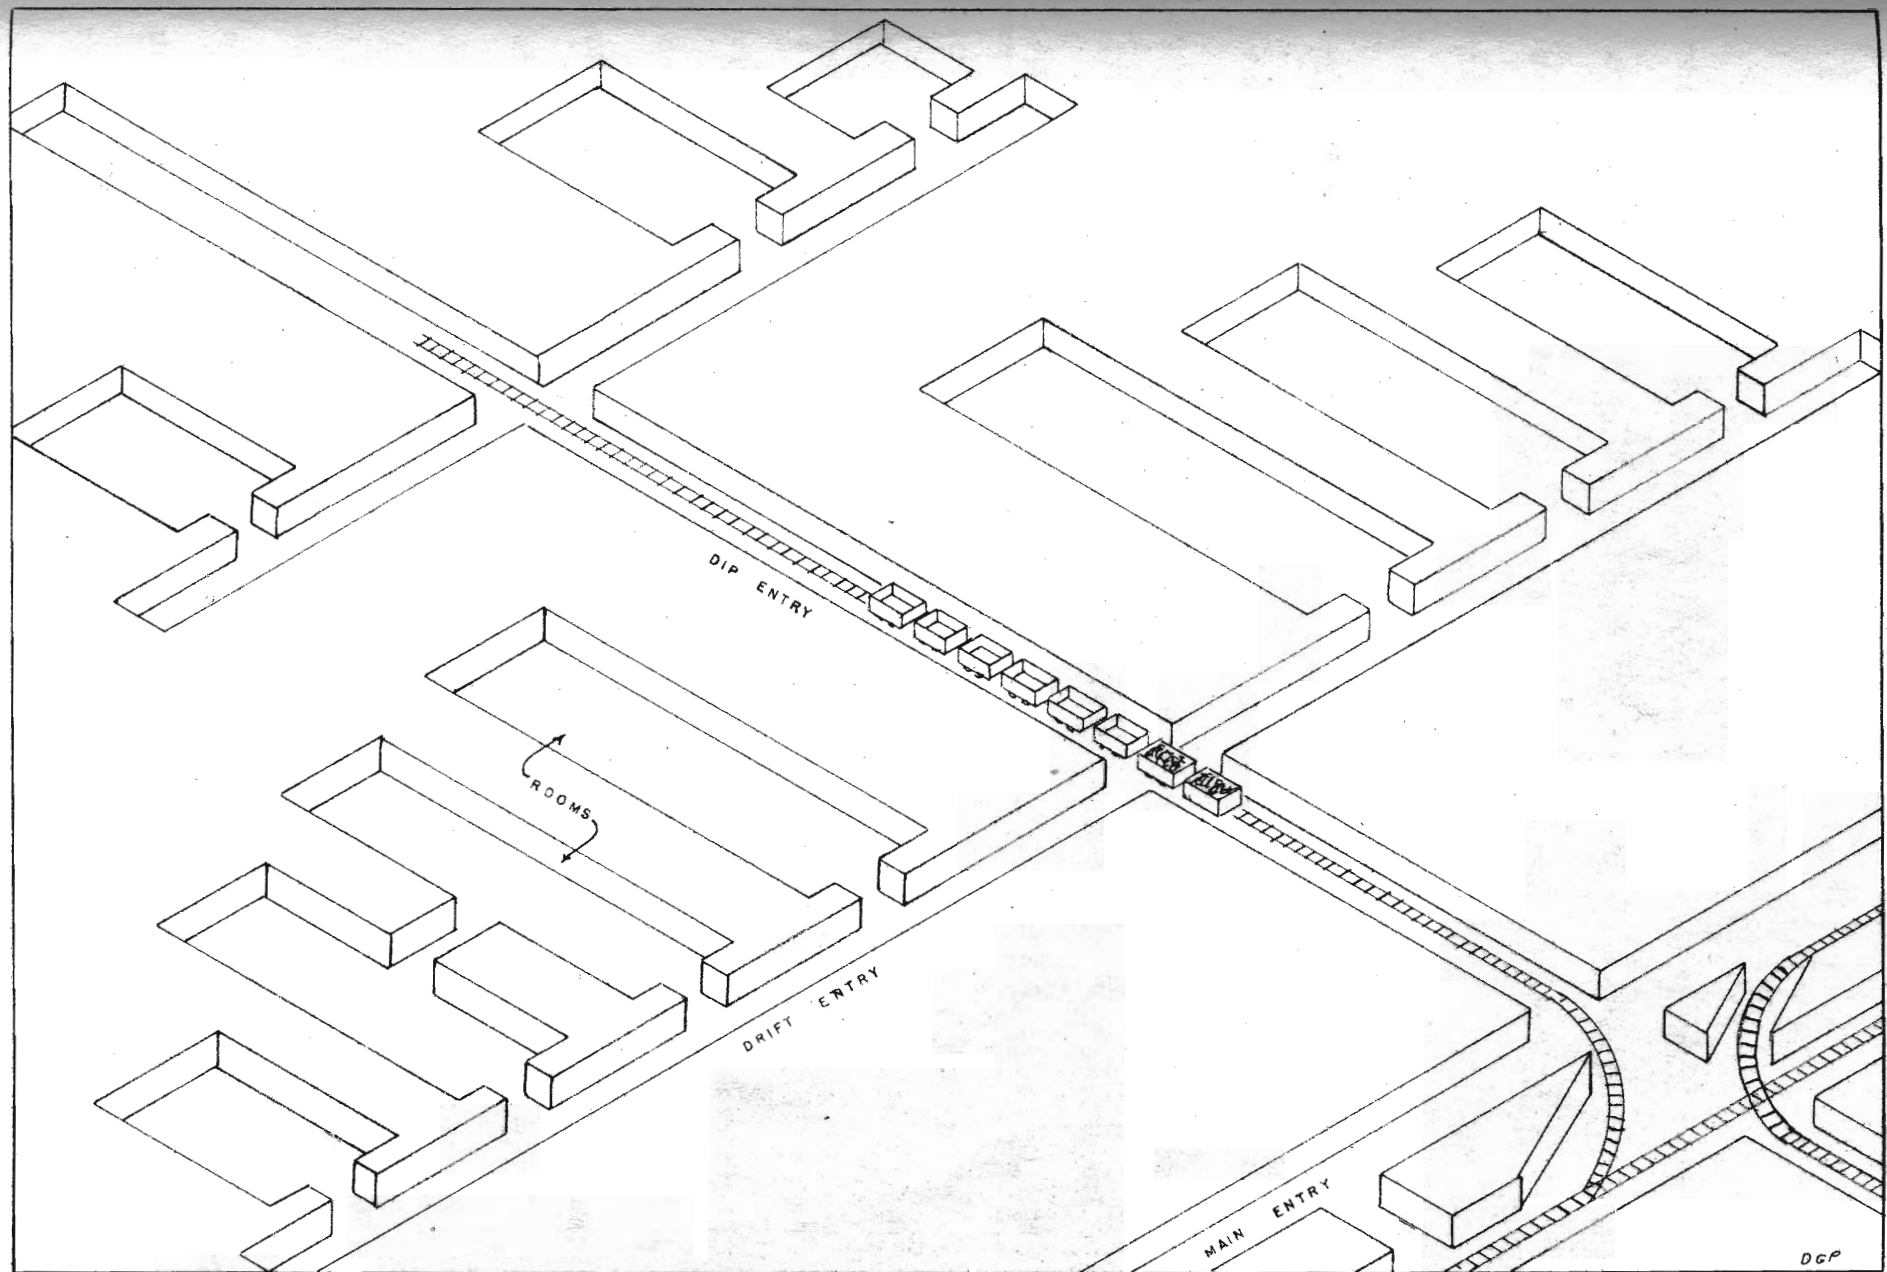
PLATE VI, Cutaway drawing of a typical bituminous coal mine.
